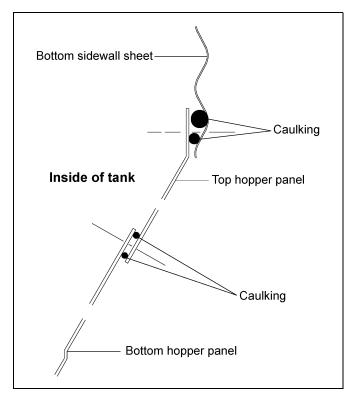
D 15' 60°, 18' 45° and 21' 45° *Hopper Sheet Detail
